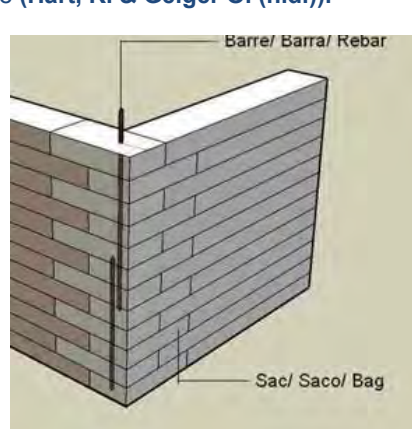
Corner Reinforcement Using Rebar (Hart, K. & Geiger O. (n.d.)).
